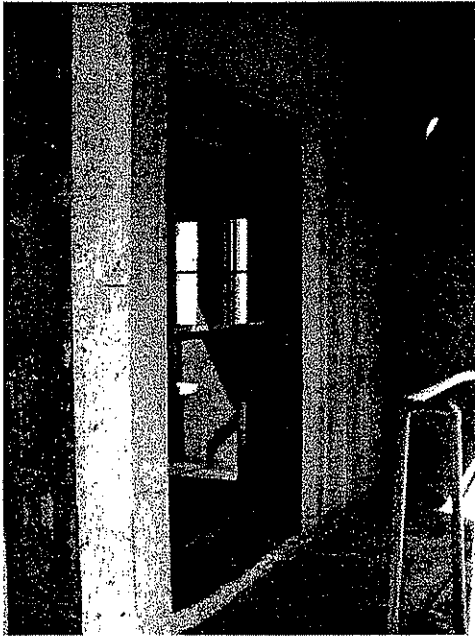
A new opening was cut in corridor to allow access to fire escape area. West elevation. The windows were left place and incorporated into interior floor plan and residential unit configurations.
